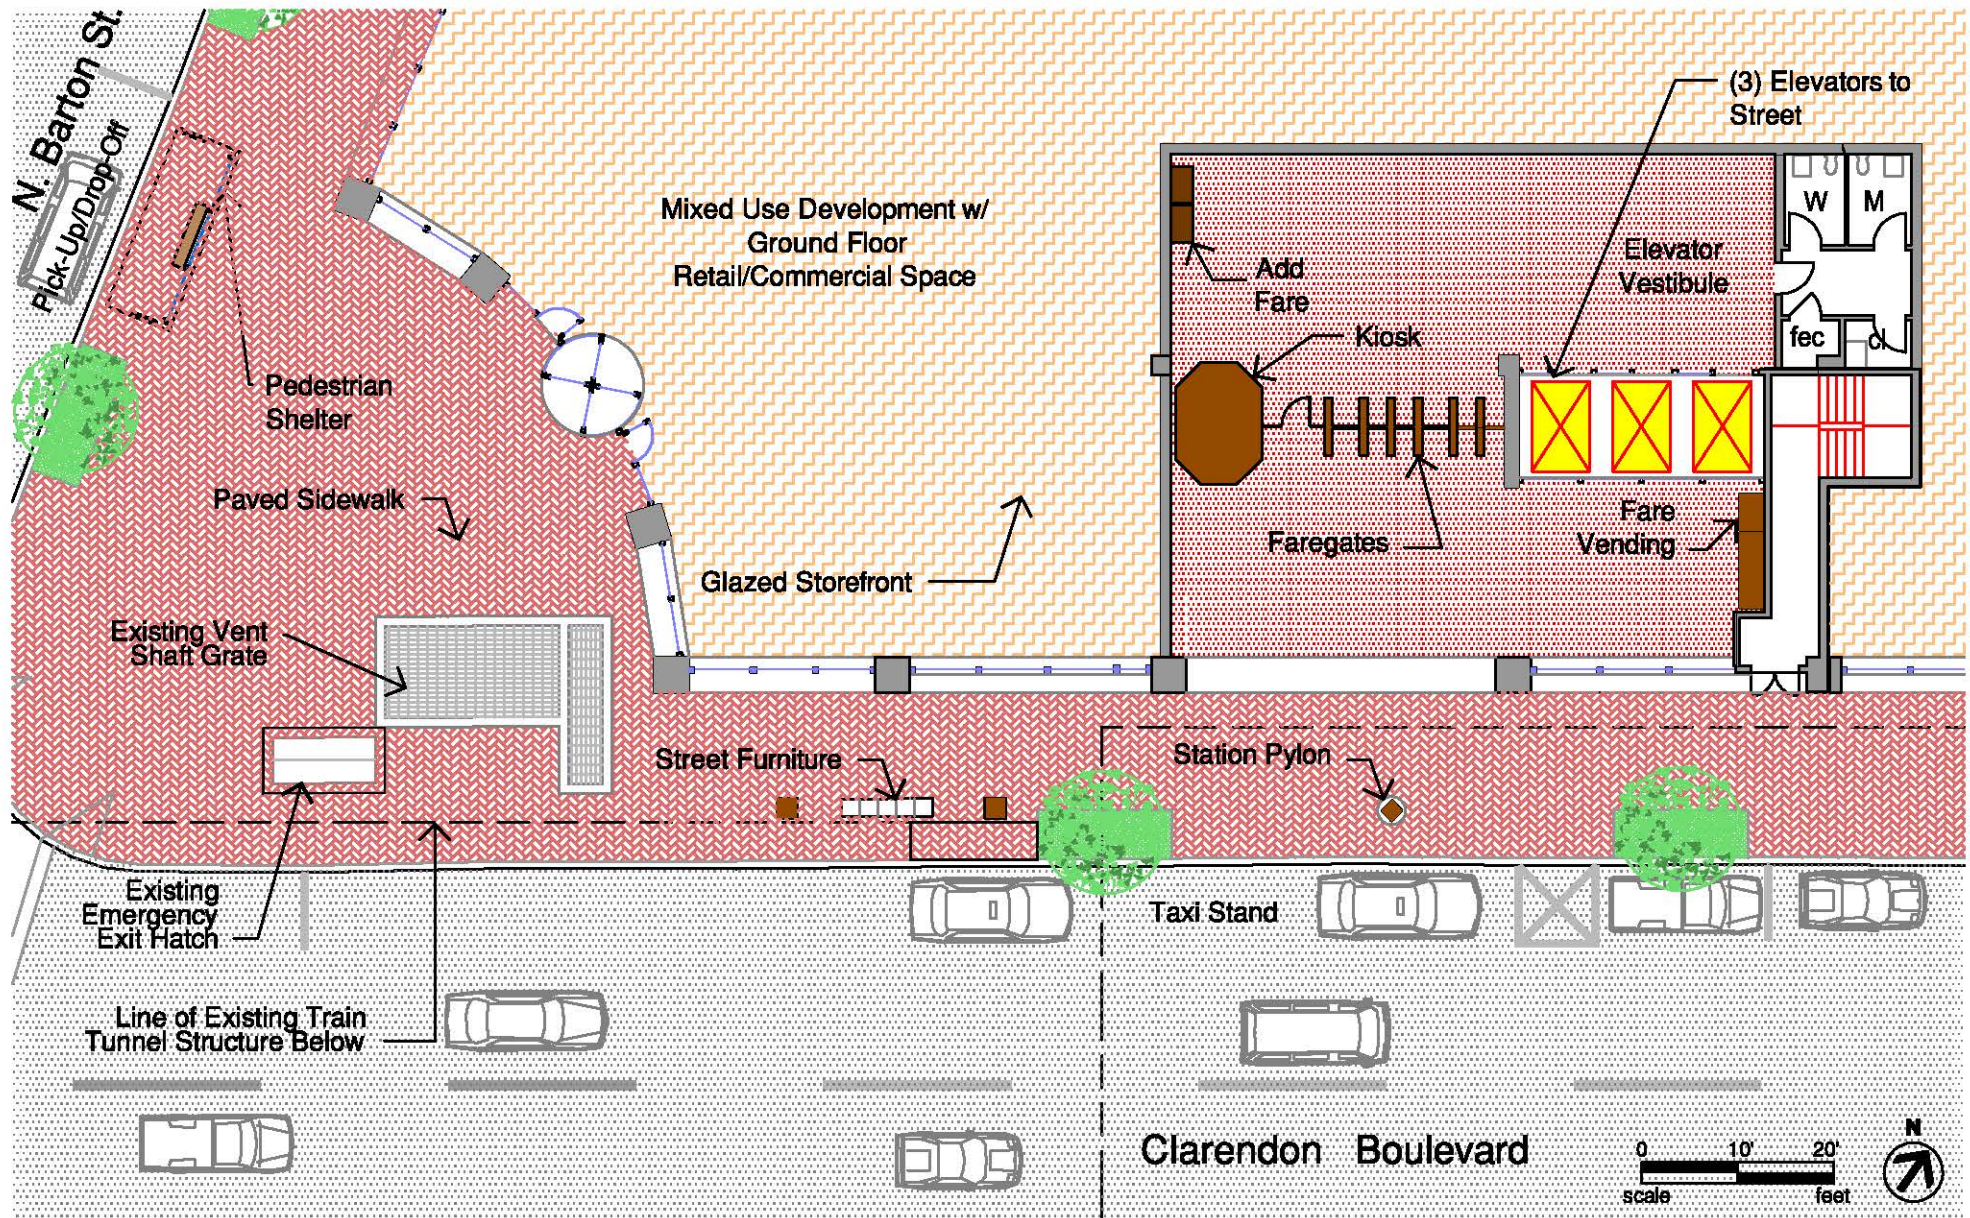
Court House Station Aerial Plan - Proposed New Entrance and Mezzanine
